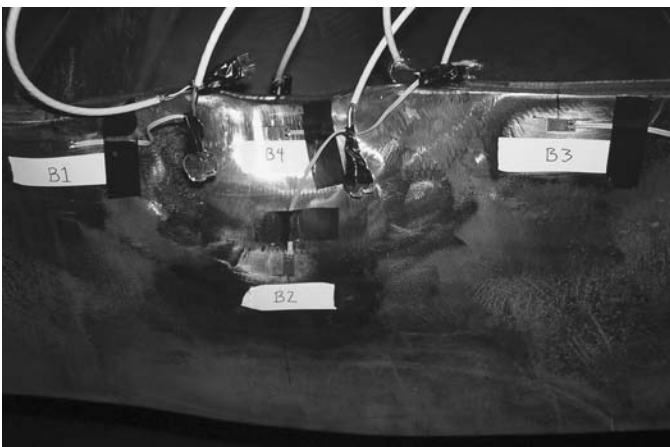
Strain gage layout (looking up at the bottom surface of flange).
